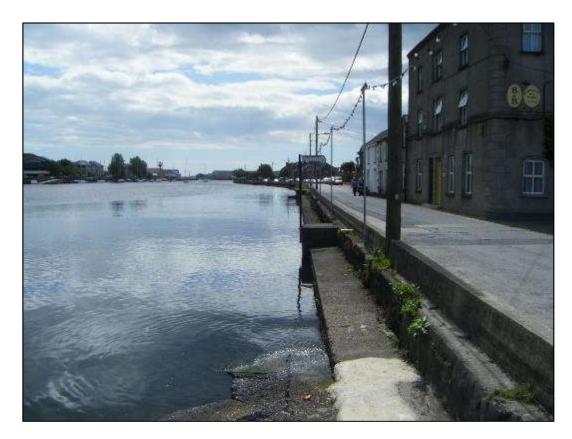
View of the existing stone wall along the South Quay (note encasement containing existing combined sewer)
